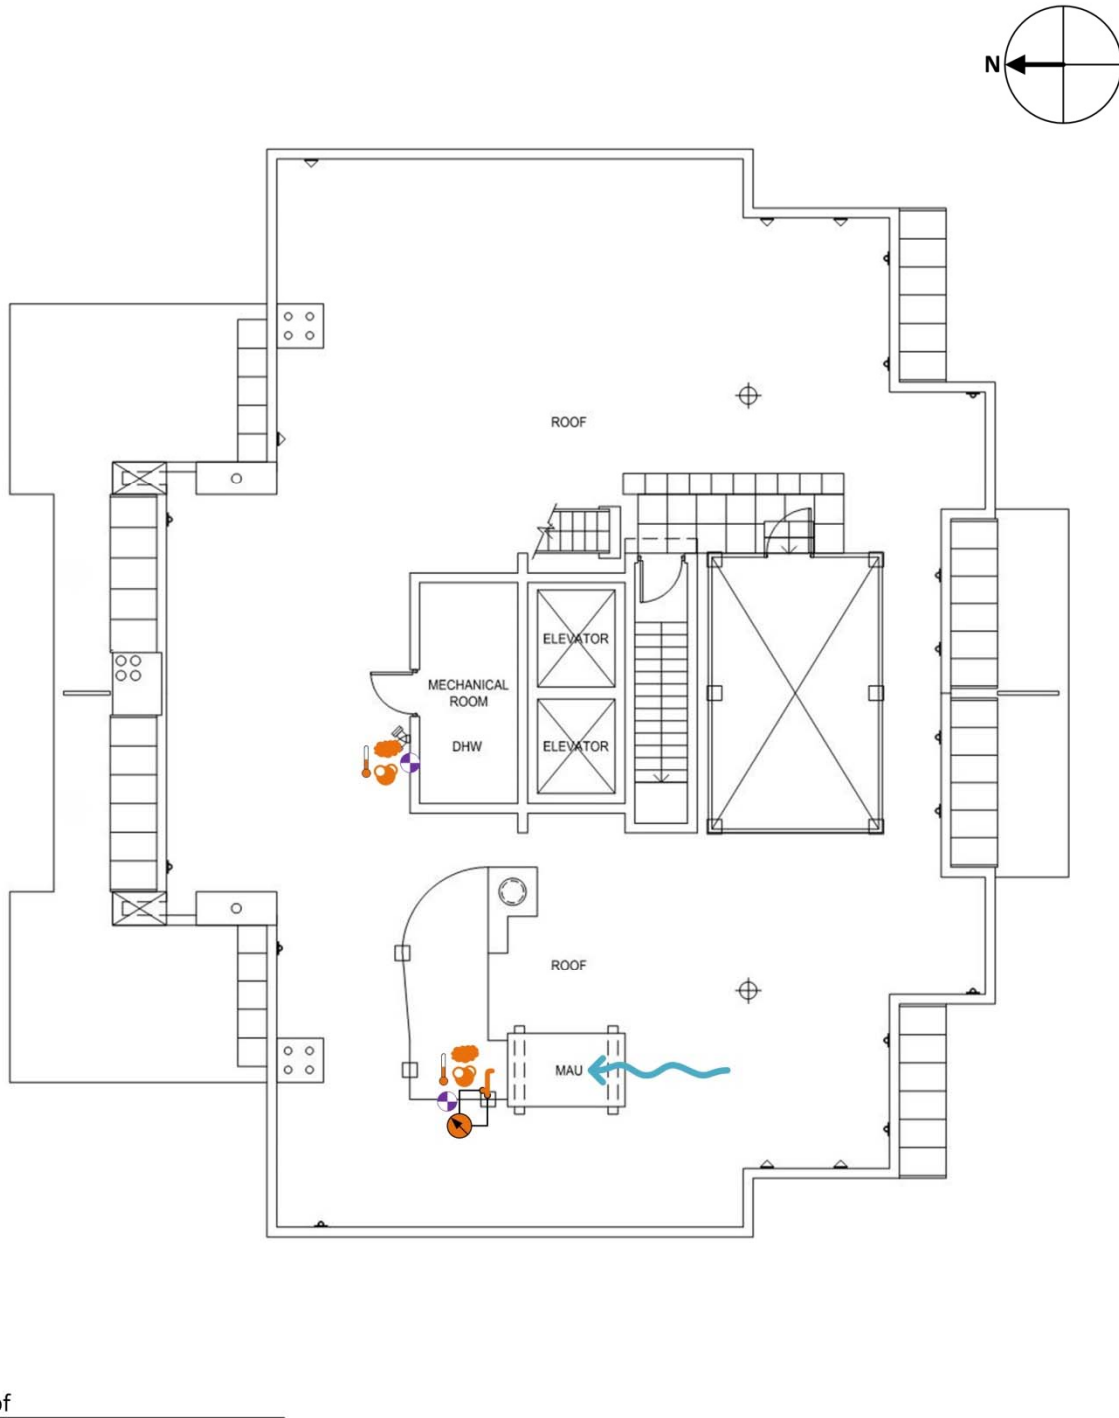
Floor plan showing layout of monitoring equipment for the roof
